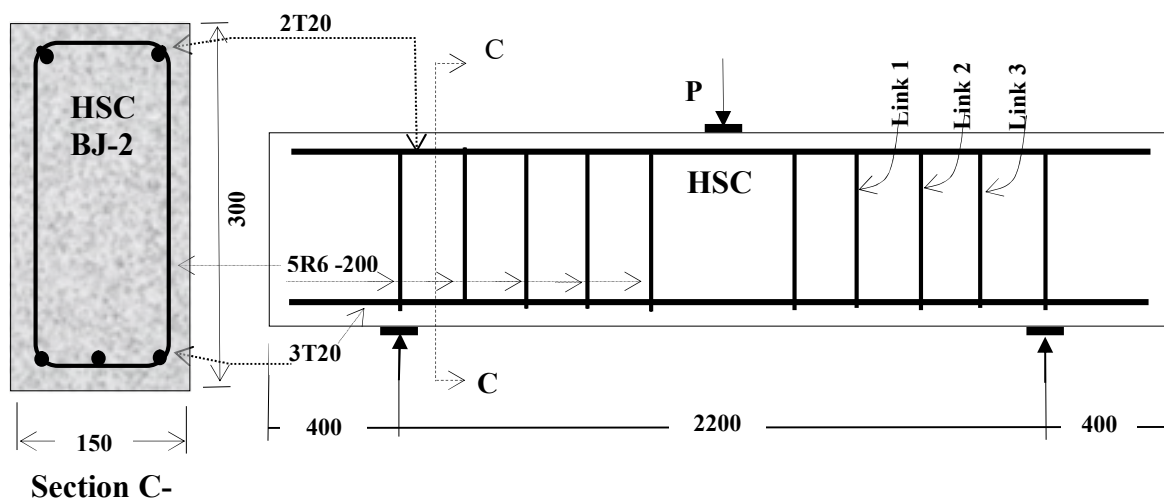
Details of the HSC beam BJ-2, which included stirrups- $a/d=4.15$.
